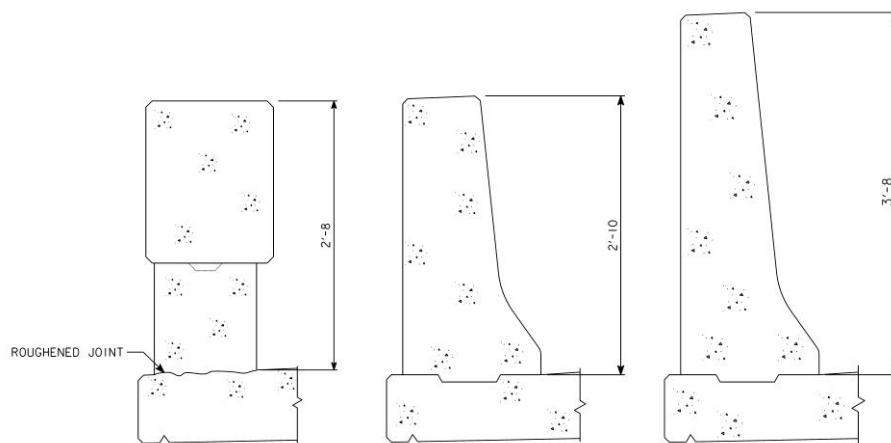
Open Rail TL-4 Barrier, F-Shaped TL-4 Barrier, and F-Shaped TL-5 Barrier
